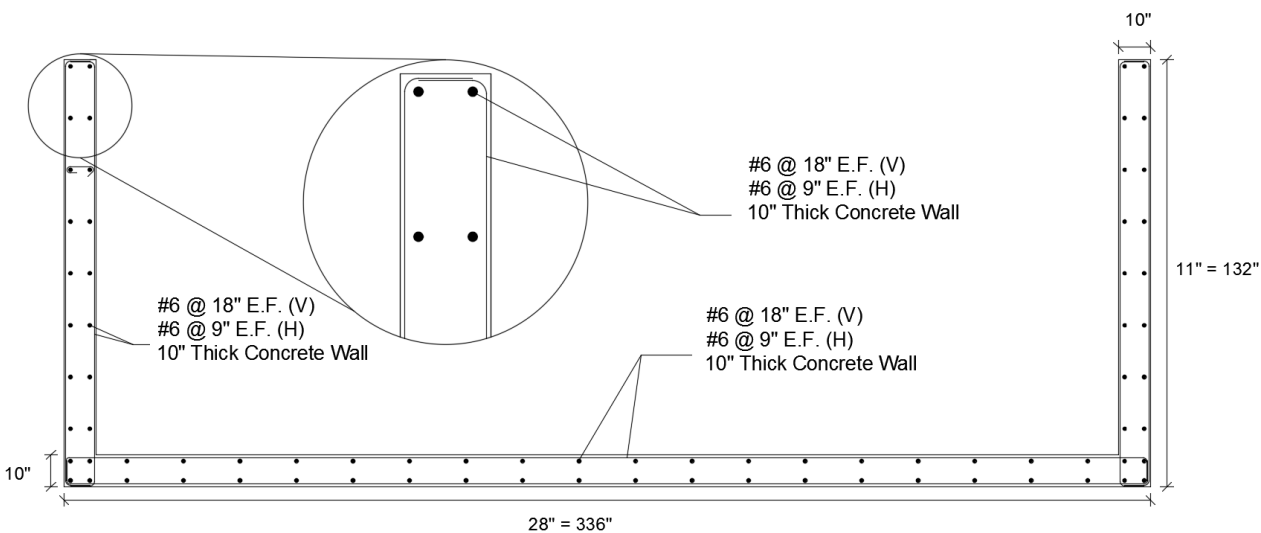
Original Elevator/ Mech. Room shear wall cross-section at the 3rd floor level
